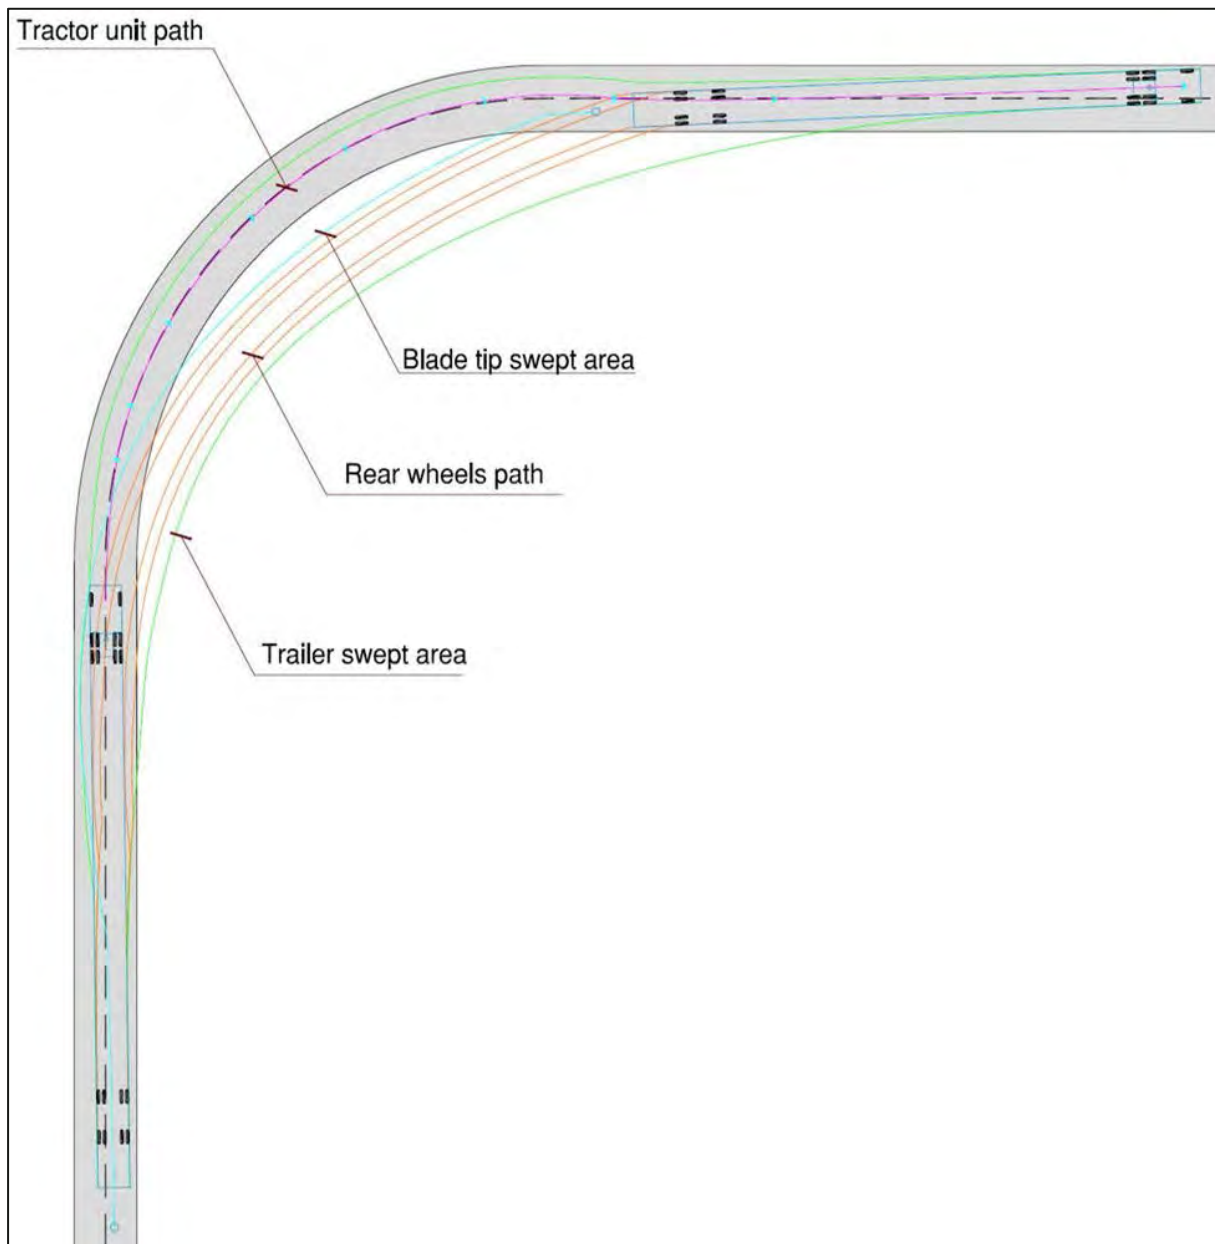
Swept path of blade transport vehicle with steerable rear wheel axles for low load trailer showing inside bend only
